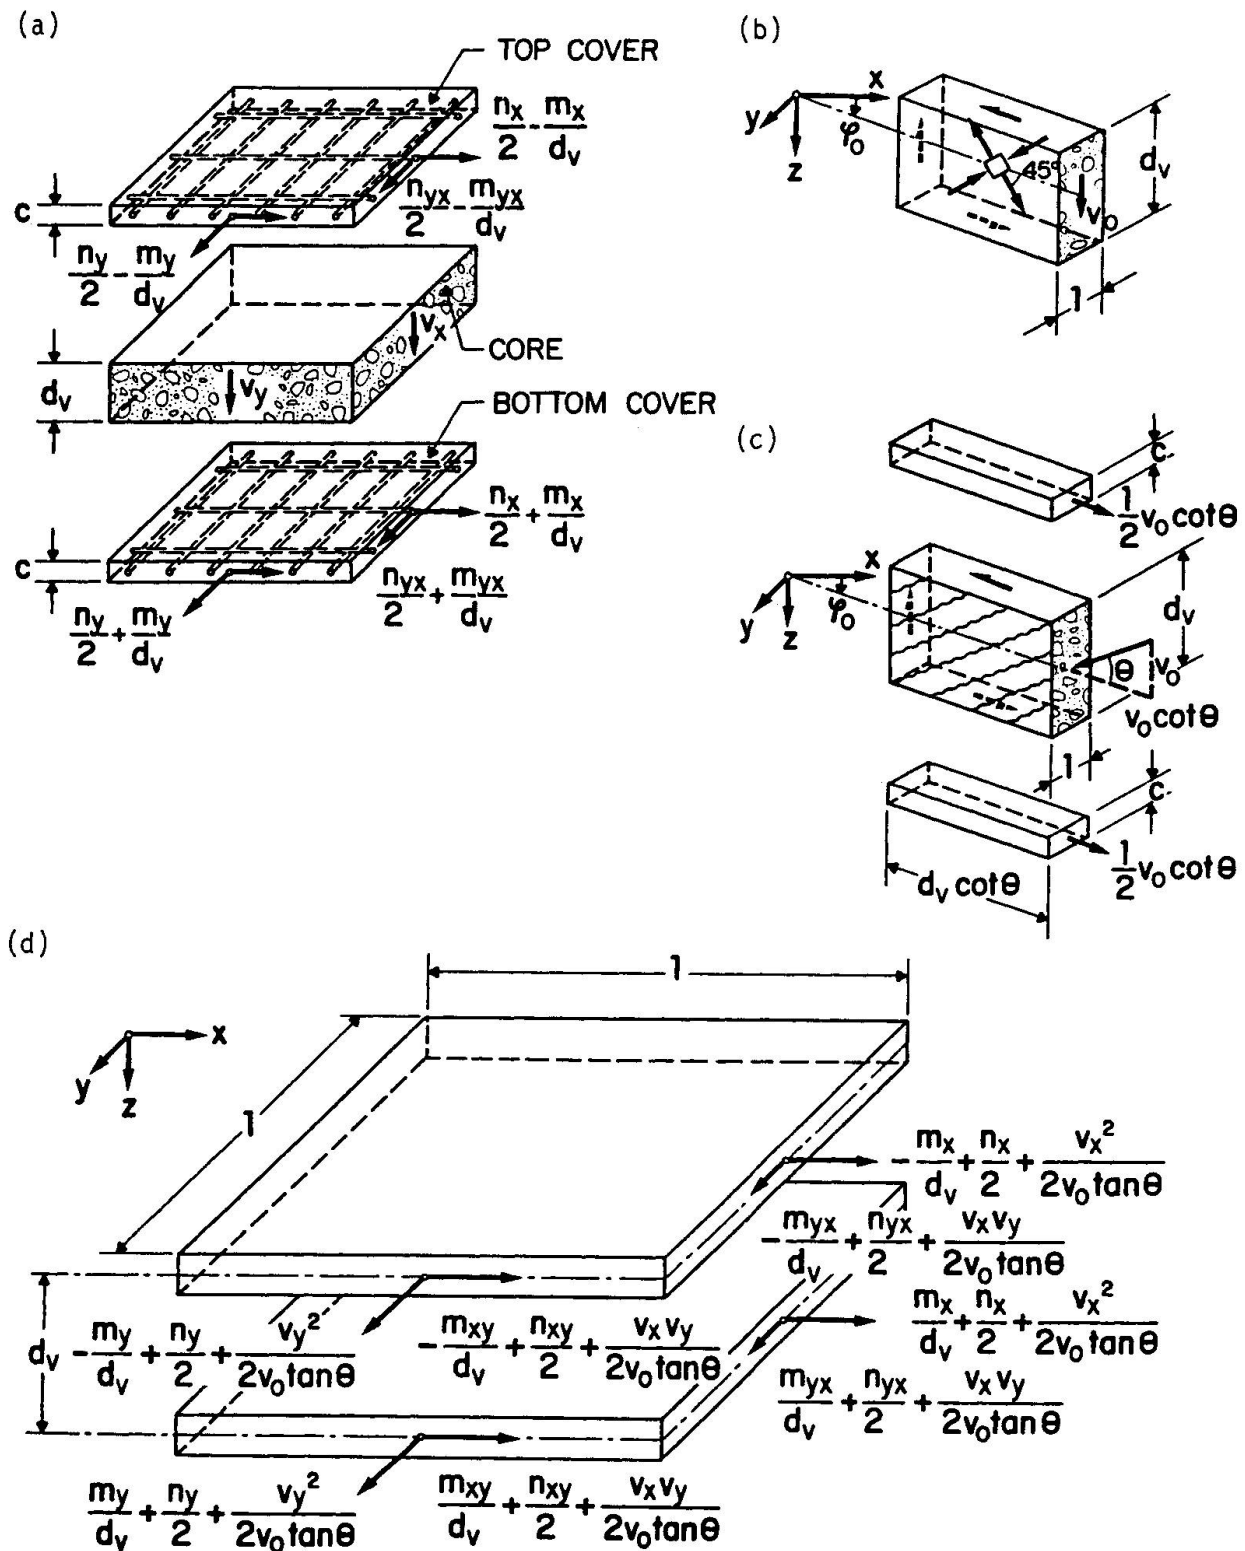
Limit design of slab elements: (a) Sandwich model; (b) Pure shear in uncracked core; (c) Diagonal compression field in cracked core; (d) Forces acting on cover elements.
